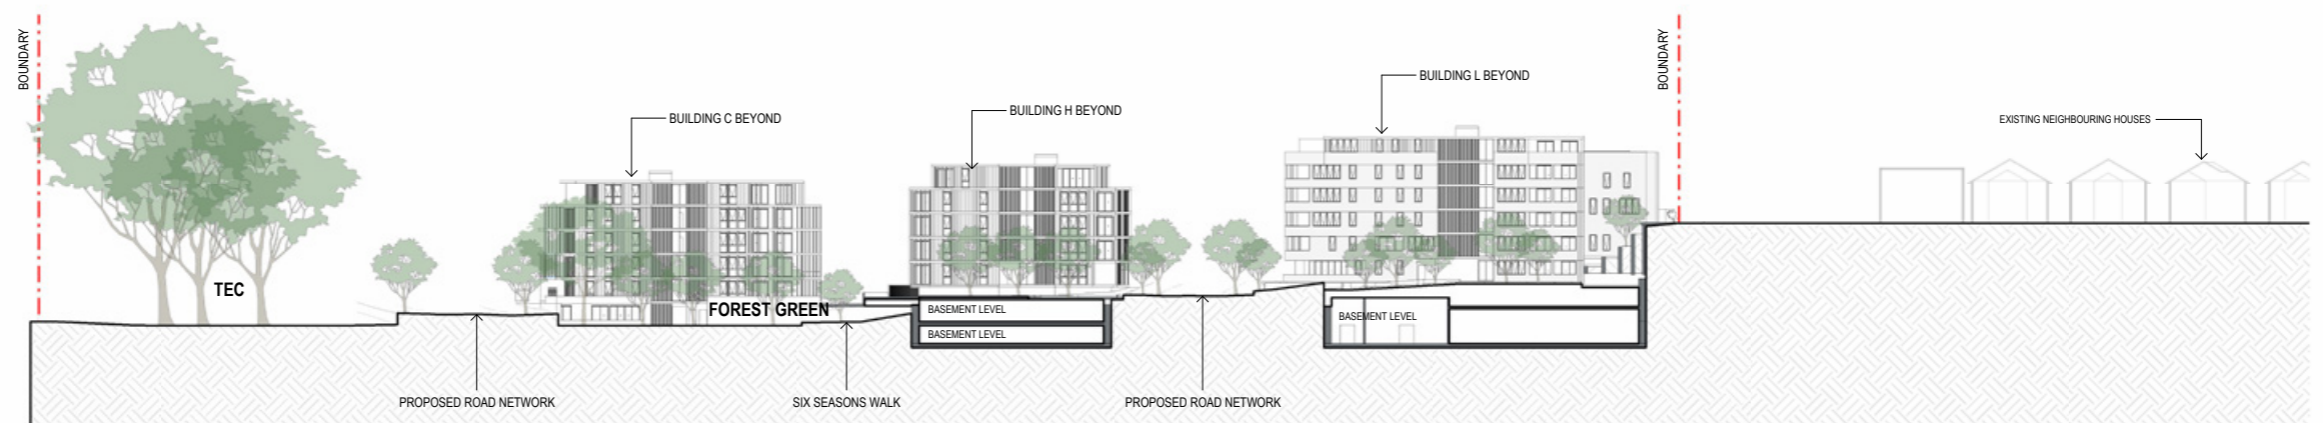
Sections Type B - Sheet 1, Created by Group GSA July 2025
